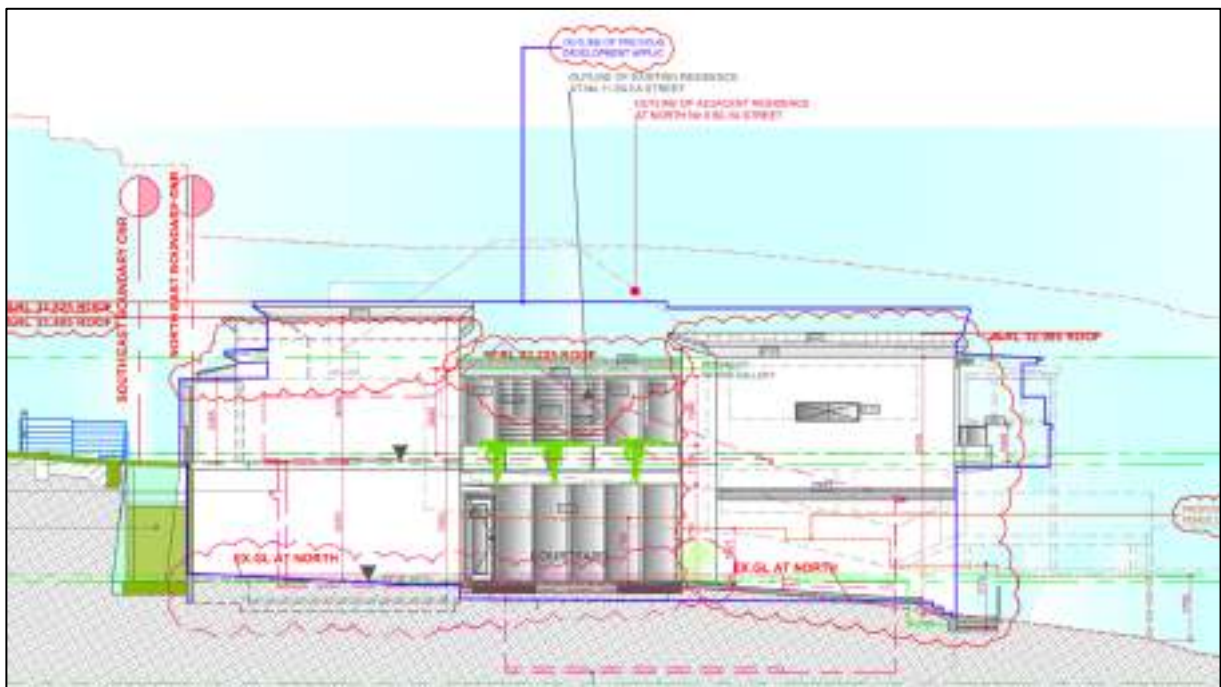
Proposed northern elevation showing the proposed building height in the context of existing height of the pitched roof at 9 Silva Street shown in grey dashed line.
